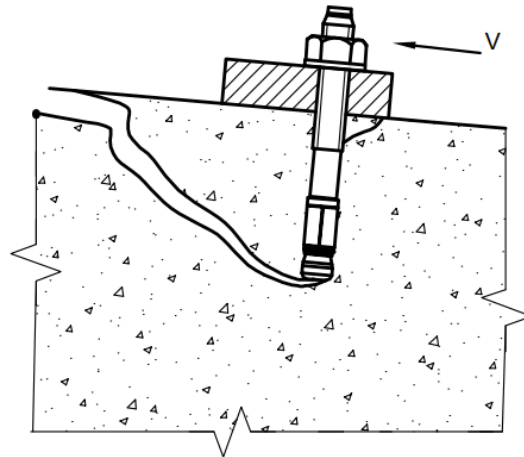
TYPICAL CONCRETE PRY-OUT FAILURE
